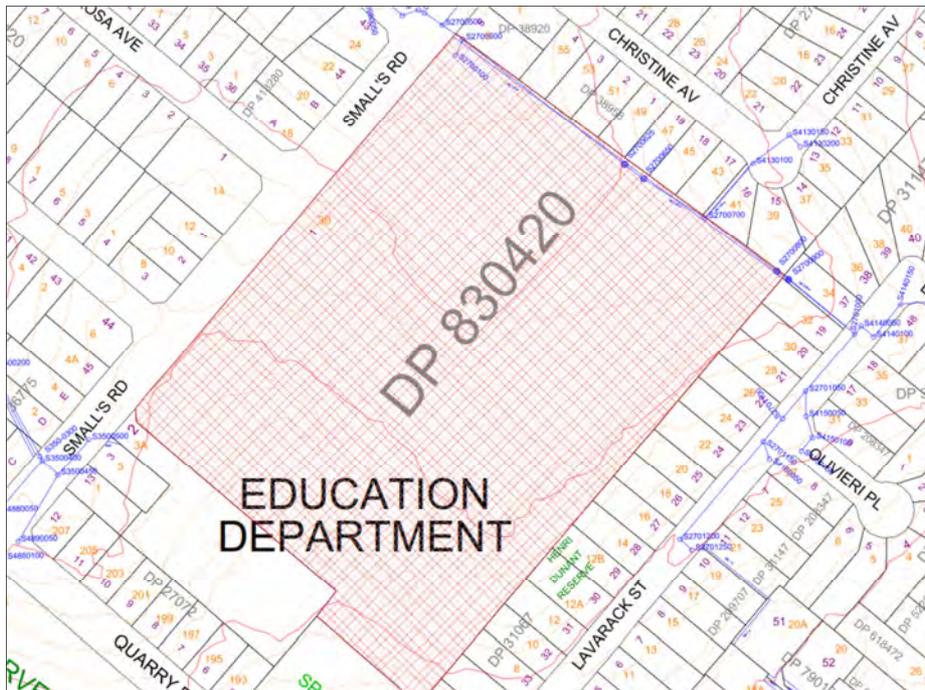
Existing Stormwater Infrastructure (Source: MYD Consulting Engineers)
